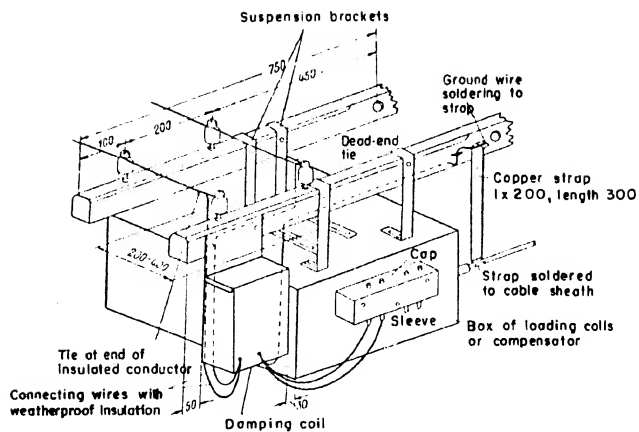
Placement of compensator (or loading-coil assembly) on cable pole.
